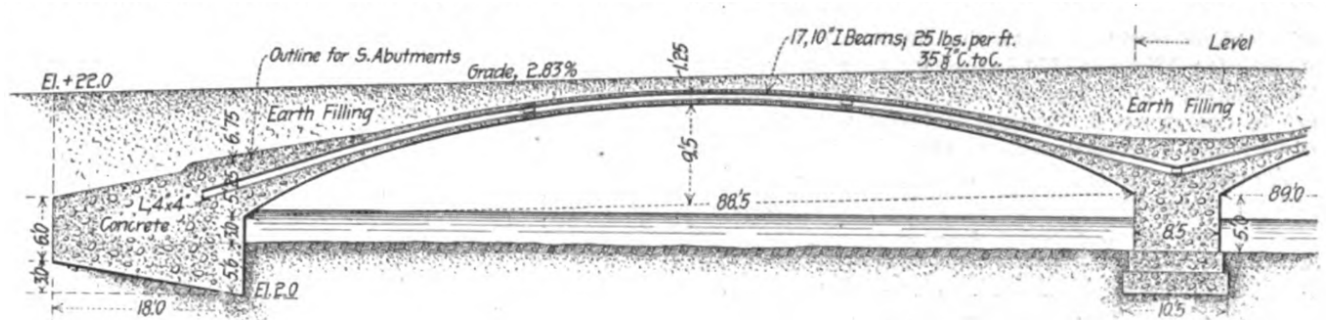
Section of the West Street Bridge. Source: *Engineering News*, March 16, 1899, page 175.
